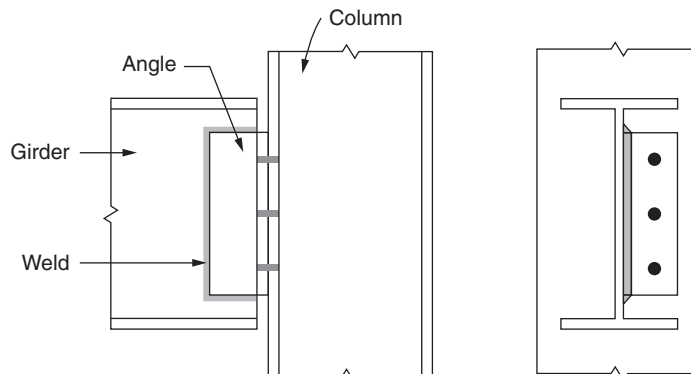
Fillet weld on one side of girder web.
